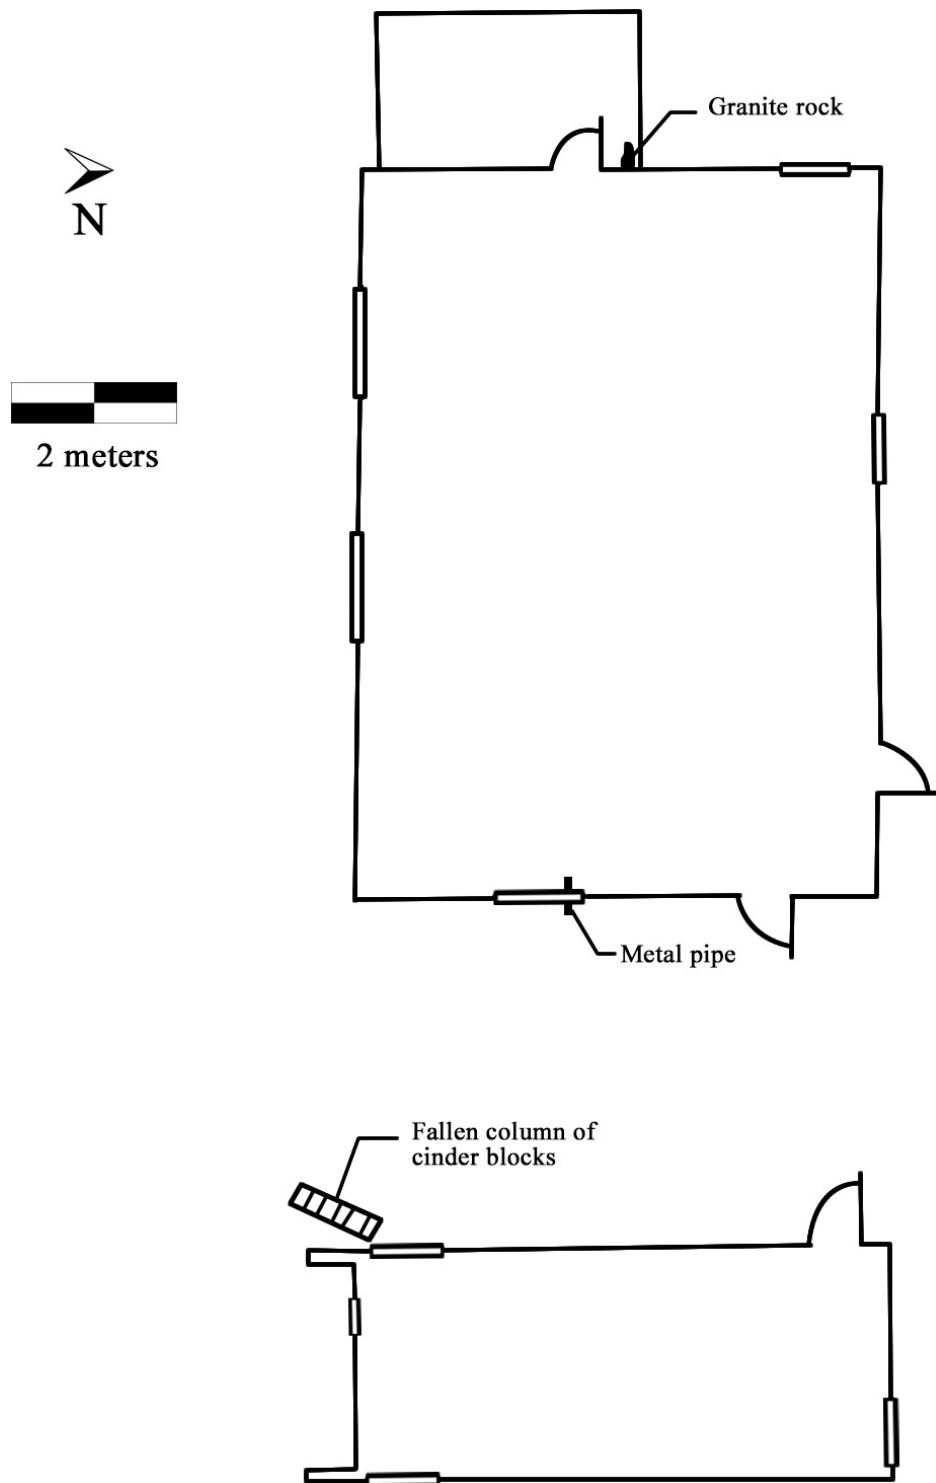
Floorplan Drawing of the Building Remains at 8BR04364.
